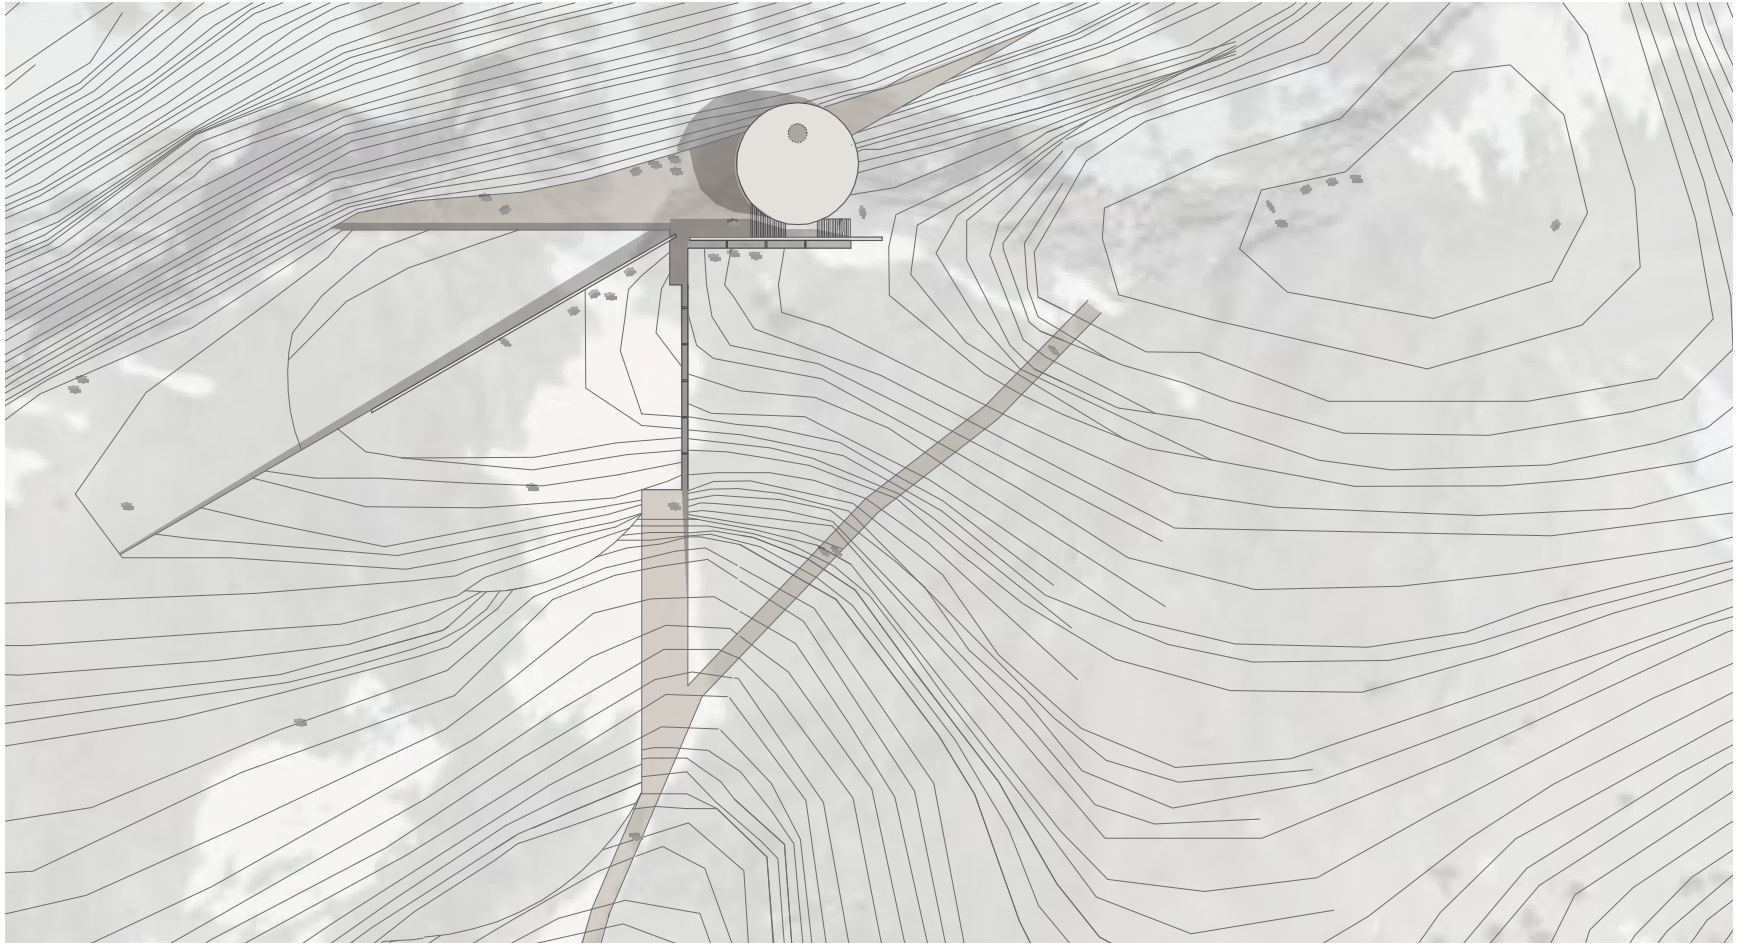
| Site plan showing exterior experience of the landscape and observatory
